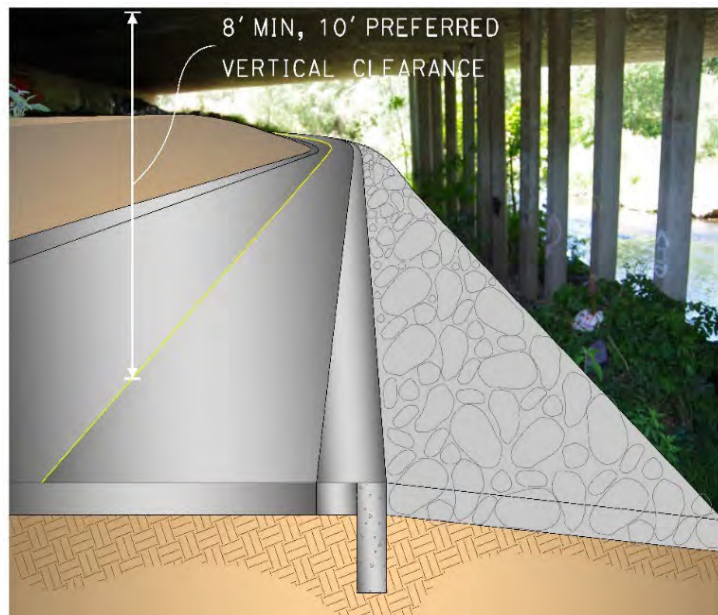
End slope at south abutment of Atkinson Street Bridge over Dry Creek.
